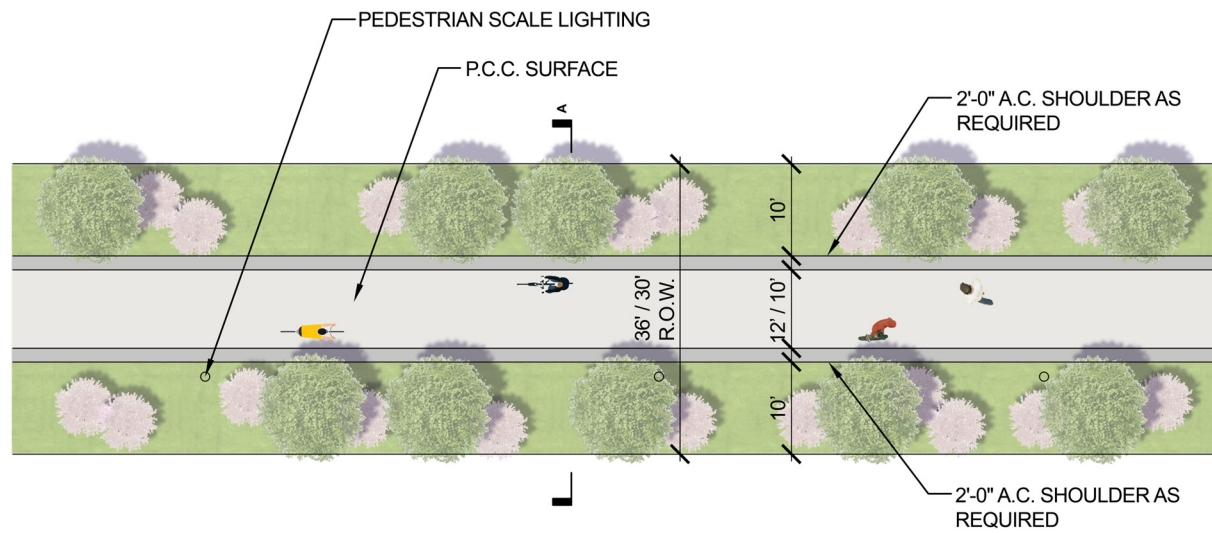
PEDESTRIANWAY/SHARED-USE FACILITIES PLAN VIEW
